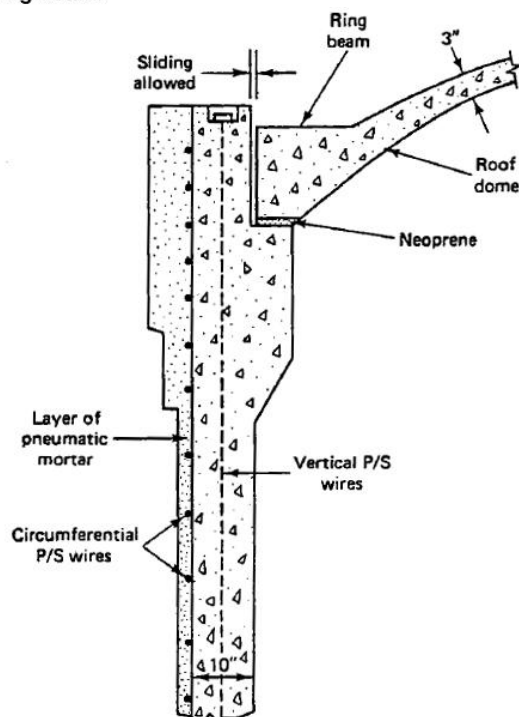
Dome prestressed ring beam support detail in Example 11.3.
